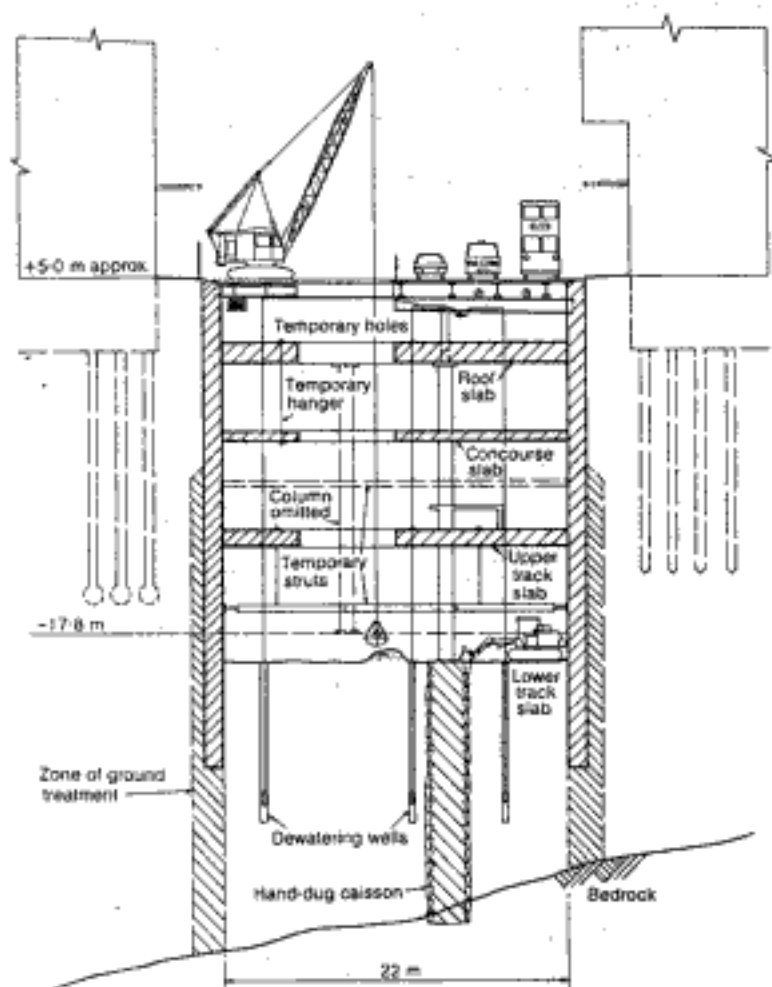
Argyle station, Hong Kong Metro: typical cross-section showing top-down construction for lower track slab using secant pile walls and ground treatment to secure cut-off to bedrock (McIntosh et al.³)
